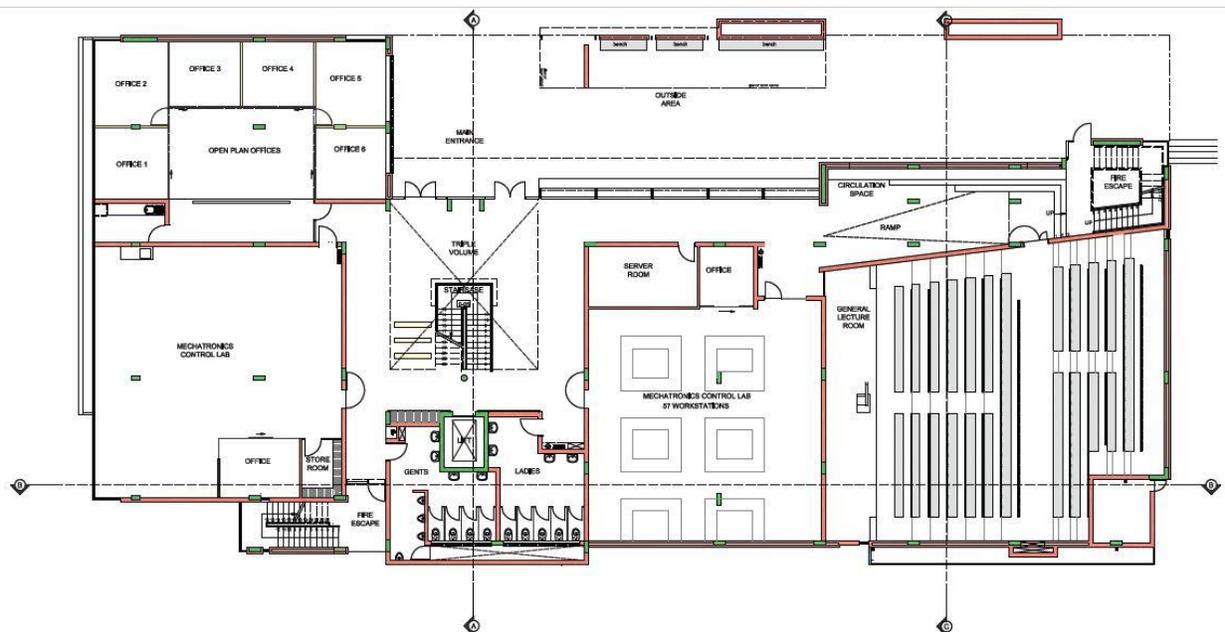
Ground Floor Plan of the Engineering Technology Building (ETB) on the Central University of Technology (CUT) campus in Bloemfontein
